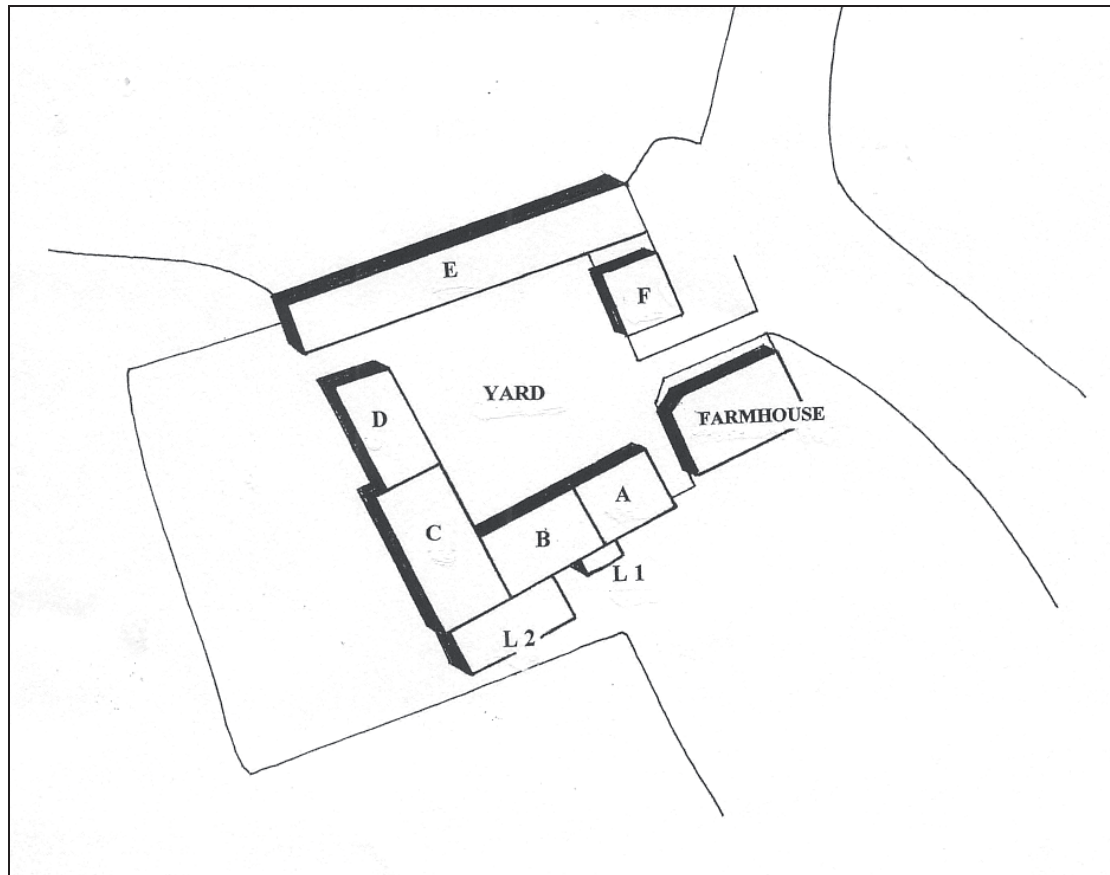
Layout of Outbuildings- Lodge Farm, Dadlington.
